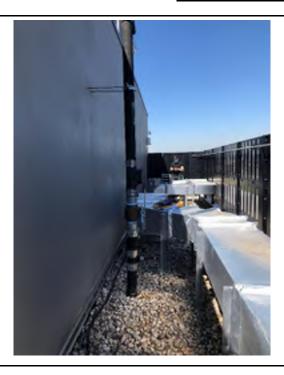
V4 riser in good condition, facing west. 8 April 2021.
